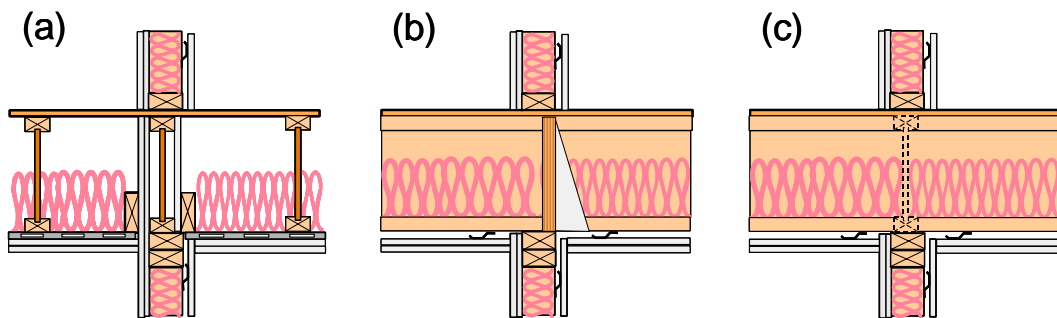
Construction details of the 3 wall/floor systems. Joists were oriented (a) parallel to the wall, (b) perpendicular to the wall, and (c) with joists continuous across the wall, perpendicular to it.
